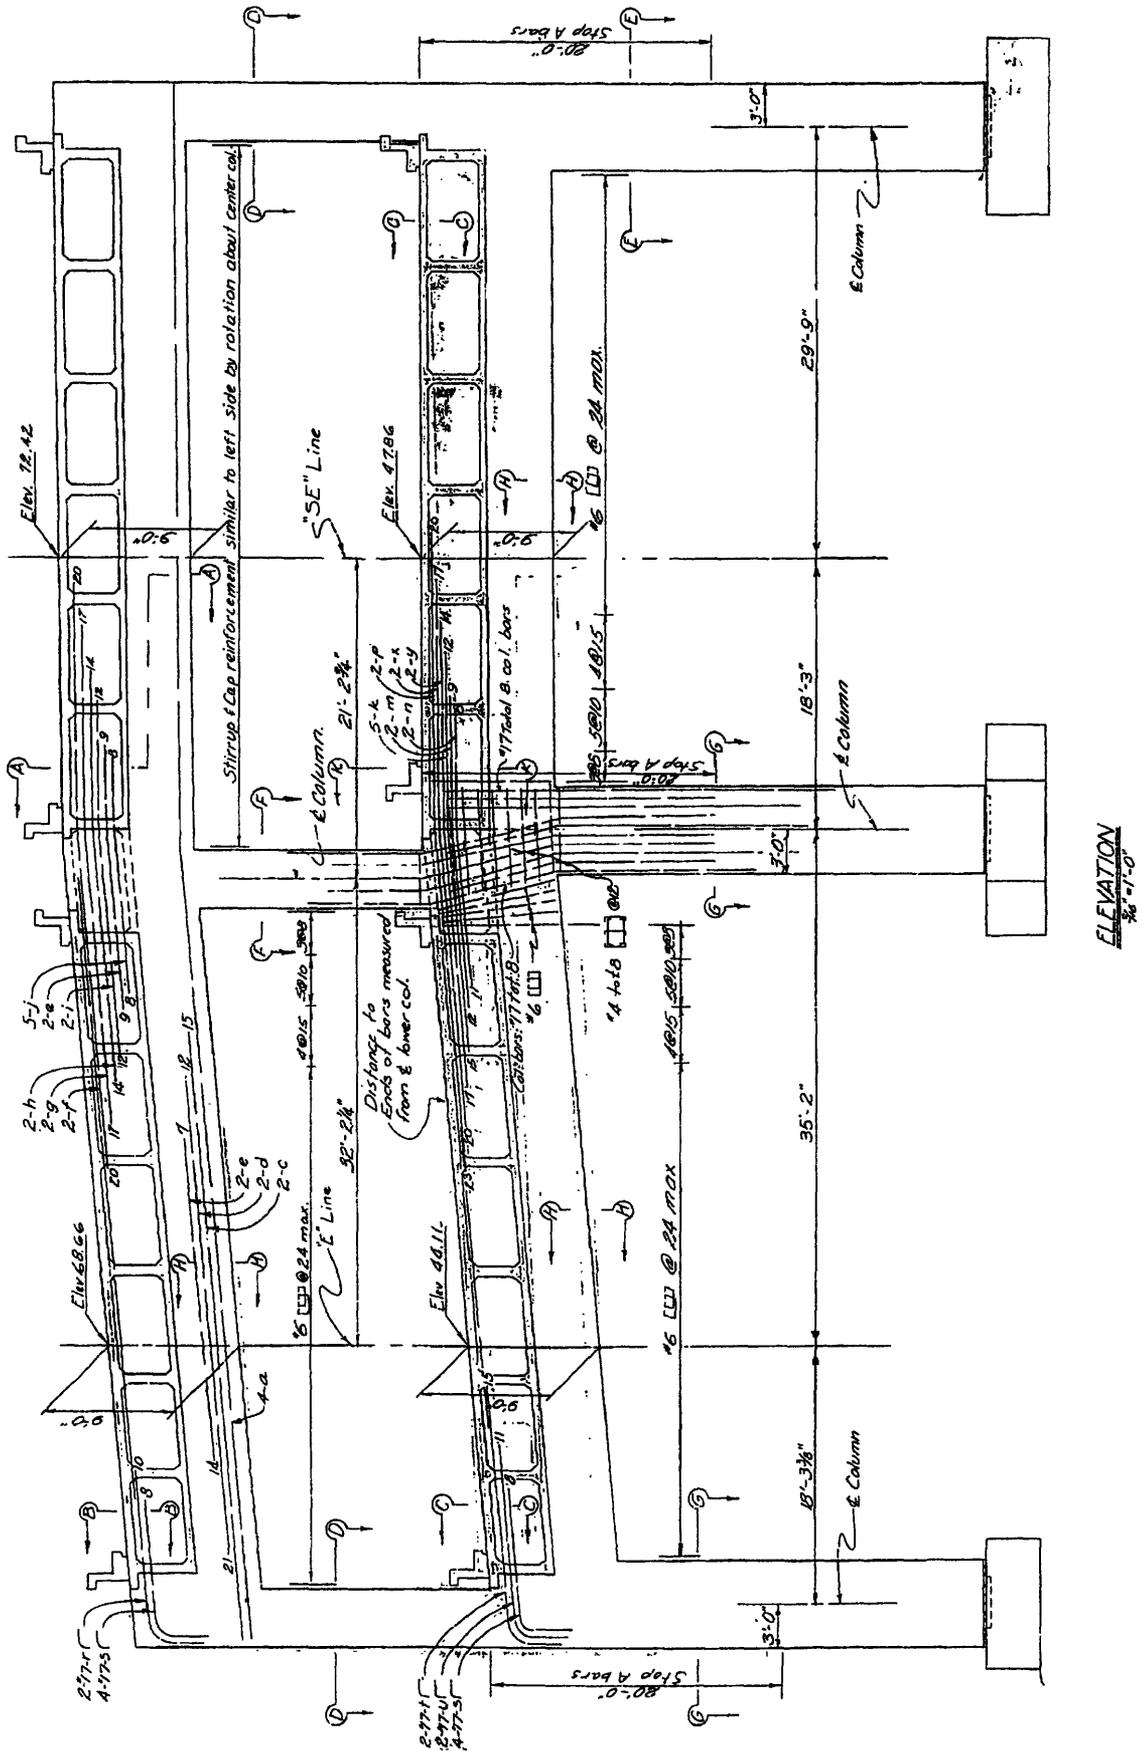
Elevation drawing of Bent 73 at Embarcadero Viaduct.
